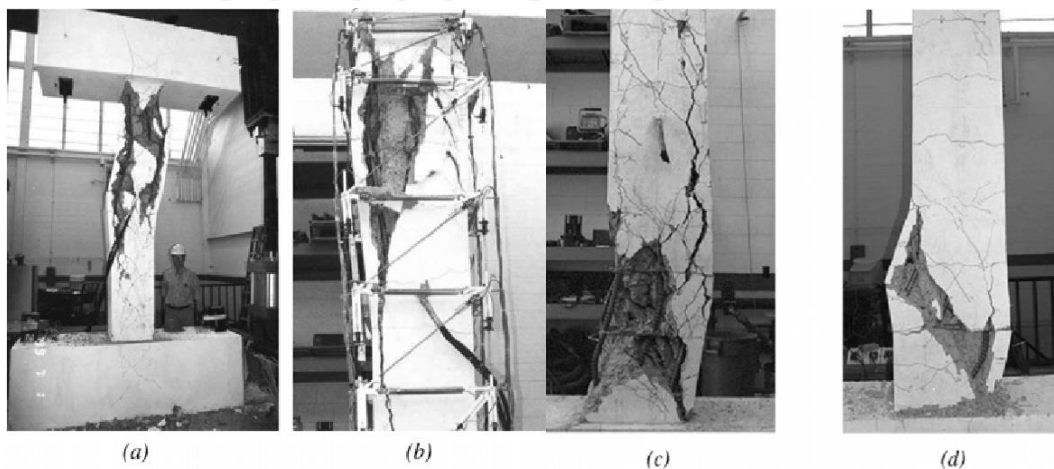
Failure of the specimen under gravitation and lateral cyclic loading [15]
